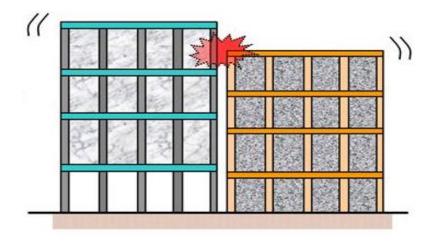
Pounding between the columns and the roof of two adjacent buildings (Murty, 2000)
